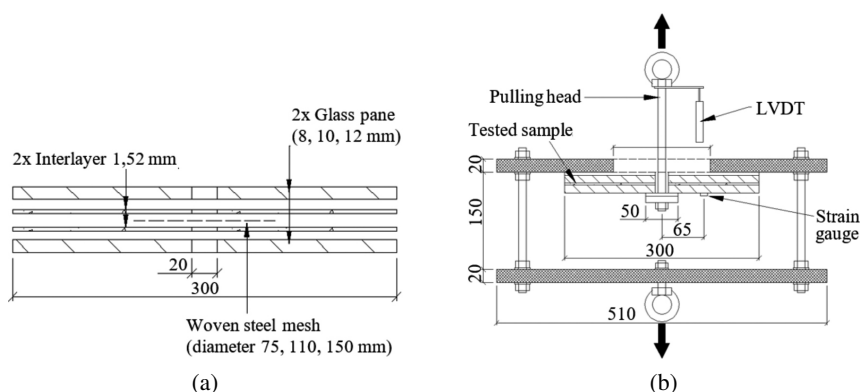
Out-of-plane loading: (a) sample, (b) test set-up
